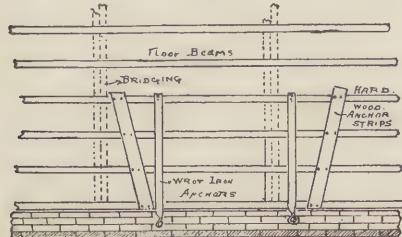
PLAN OF FLOORS SHOWING METHOD OF ANCHORING FRONT AND REAR WALLS TO BEAM.
